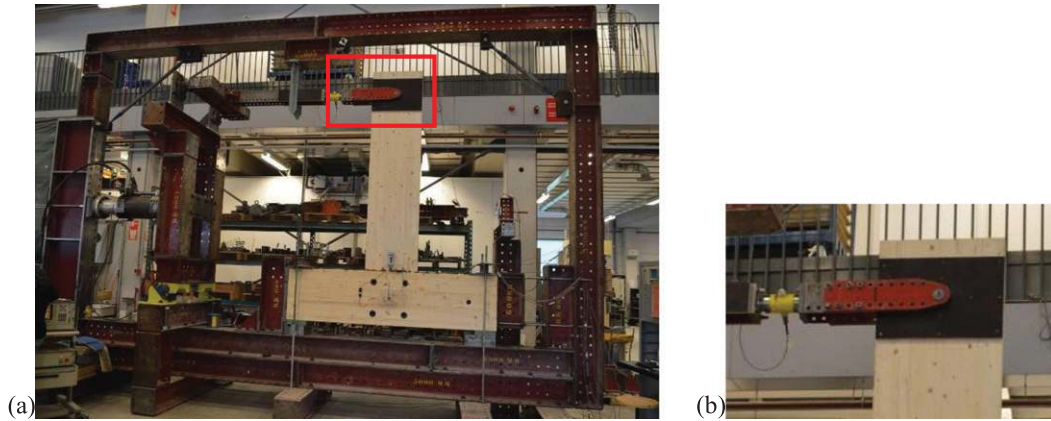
Photo of the test rig with specimen series P2 (left) and detail of the plywood sheet at the loading point (right).
